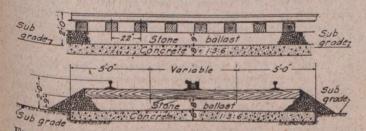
SECTION OF CONCRETE SLAB, JAMAICA IMPROVEMENT, LONG ISLAND, R.R.
